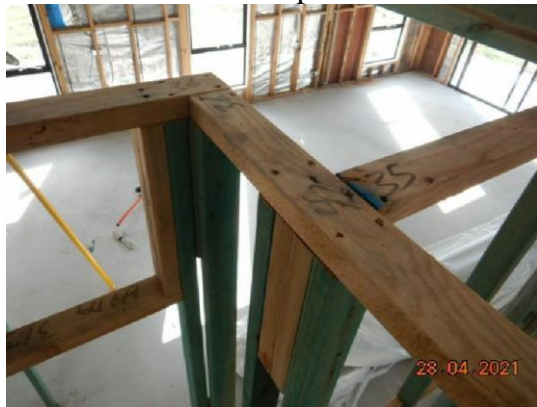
JOINING OF TOP PLATES AND RING BEAMS
